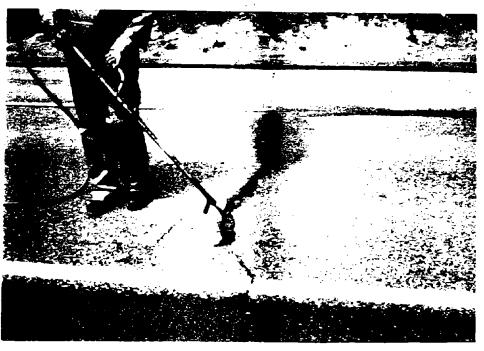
Transverse Crack Repair with CRS-2 & Sand Blotter.
